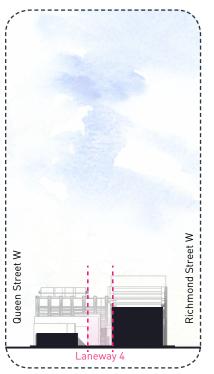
Enlarged Site Section B.A; 1:1,800 2006-2013, section
